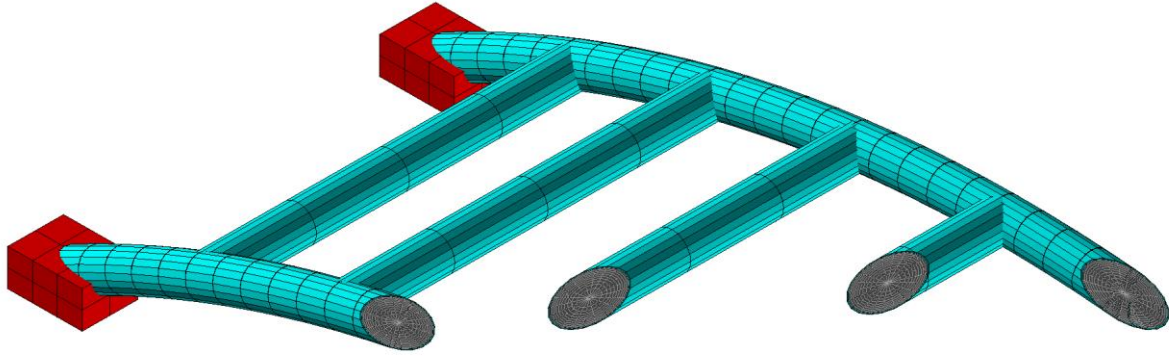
Meshed 3D single span double CFST arch structure and internal section layout
